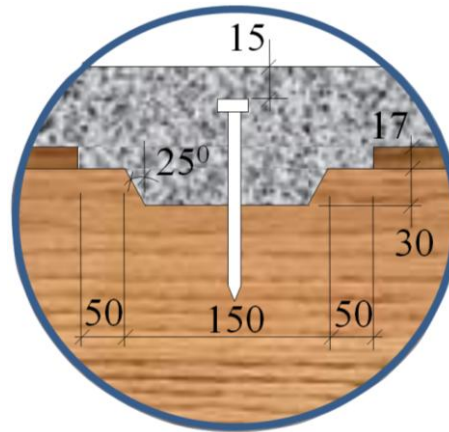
Geometric details of trapezoidal notched connections (mm).
